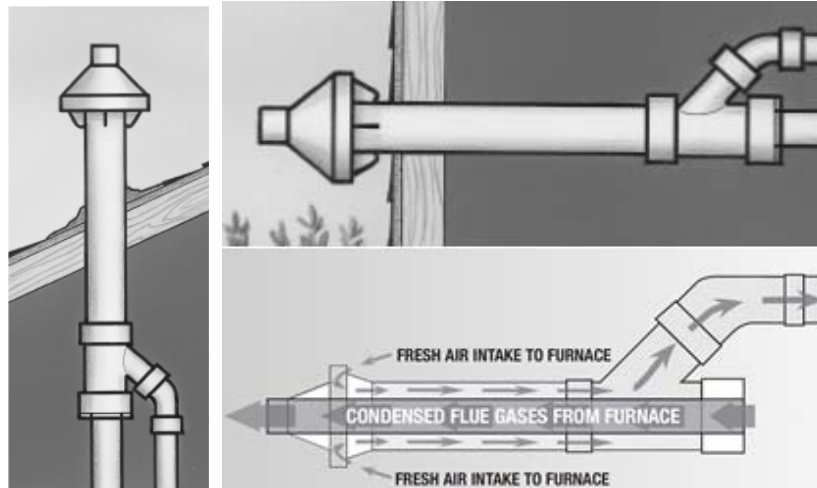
Two-pipe condensing furnace vents requiring only one wall or roof penetration. Source: www.Bryant.com.
